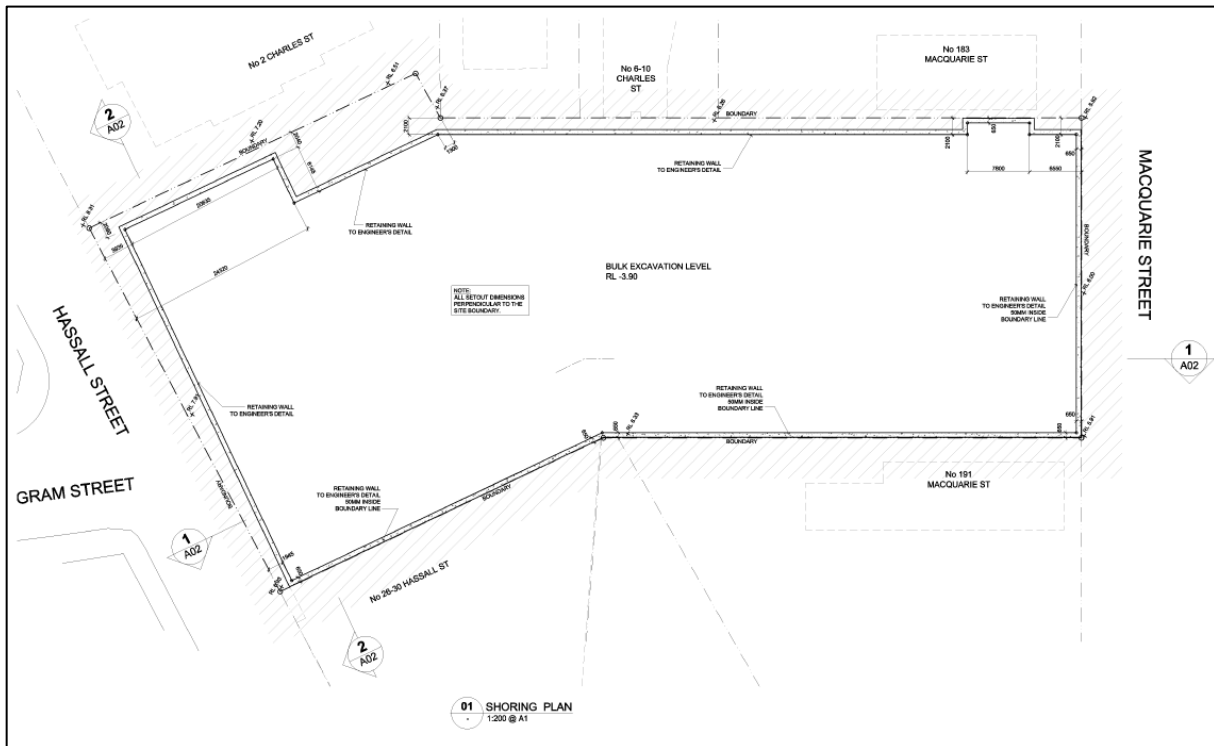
Shoring Plan prepared by Krikis Taylor Architects
